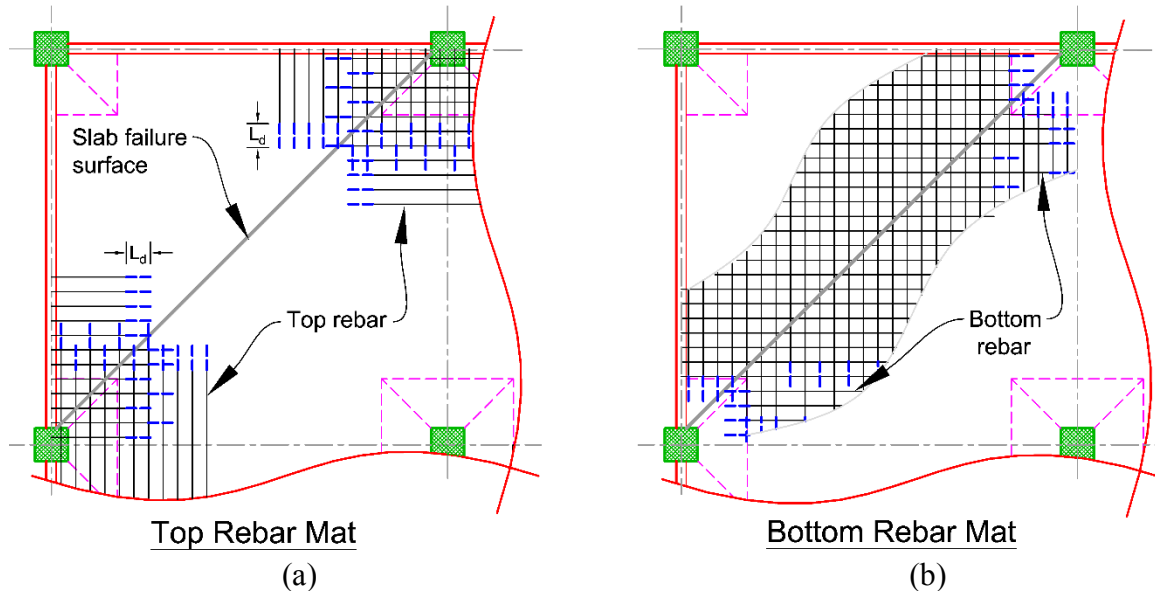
Schematic showing the slab rebar that intersect the slab failure surface due to the push at corner location. (a) top rebar mat, and (b) bottom rebar mat. The portion of the curtailed slab rebar is shown by dashed blue lines. Only the rebar near the failure surface are shown.
